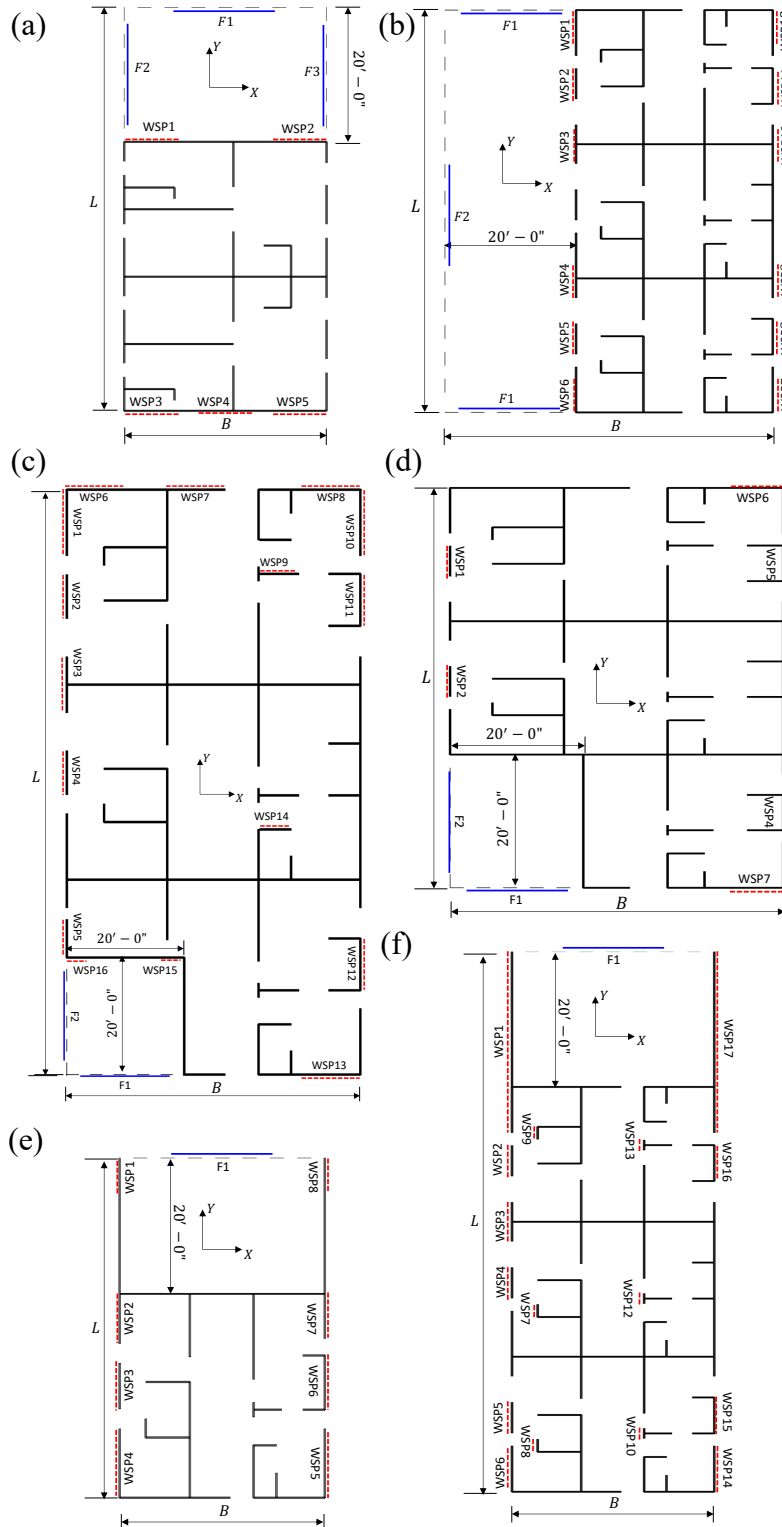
First floor plan showing wall layouts and locations of retrofit elements including moment frames and wood structural panels (WSPs): (a) L1, (b) L2, (c) L3 (L = 50'-0"), (d) L3 (L = 80'-0"), (e) L4 (L = 60'-0") and (f) L4 (L = 100'-0")
